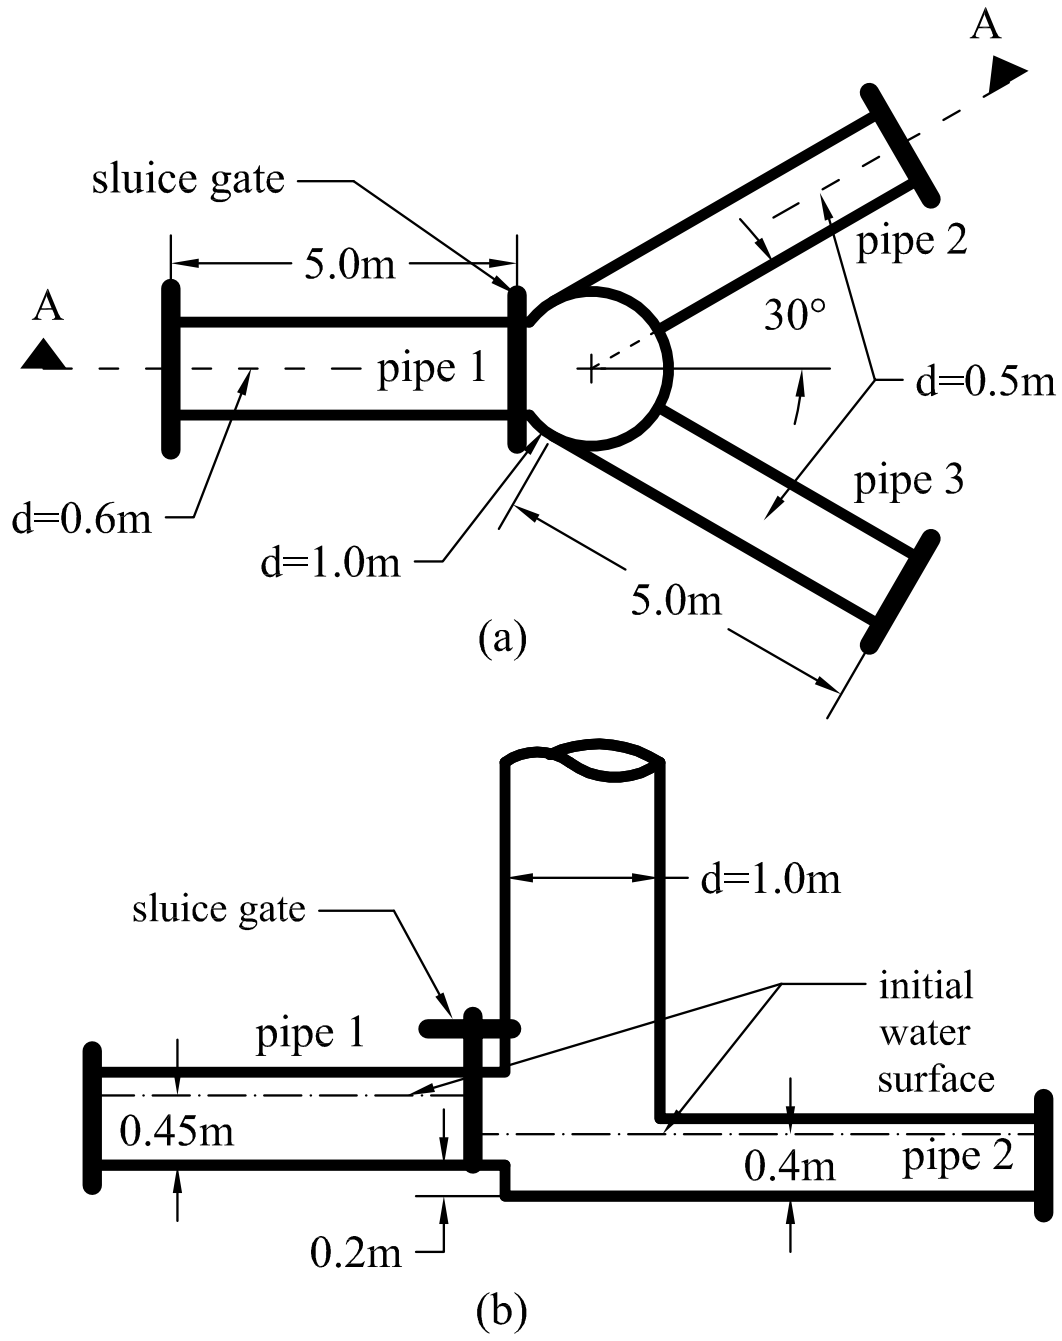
(a) Plan and (b) section A-A view for three-way dividing flow hypothetical case
